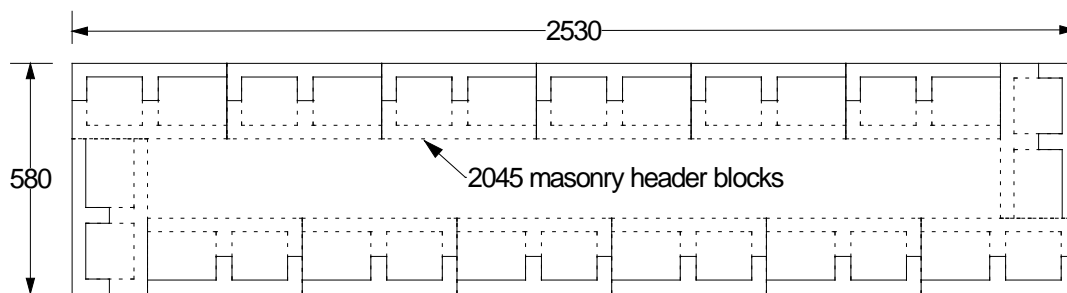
Details of the reinforced concrete slab (mesh omitted for clarity).
